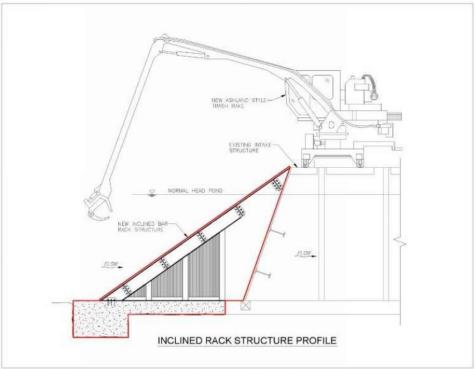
INCLINED TRASHRACK STRUCTURE - PROFILE VIEW
